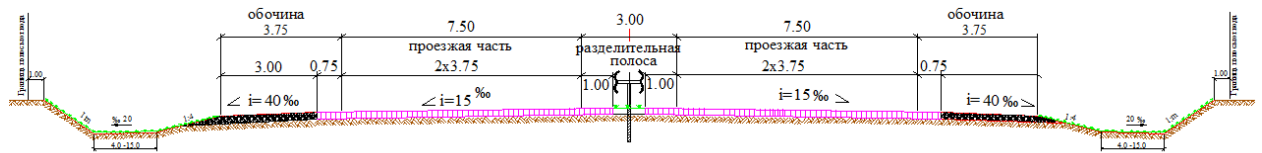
(b): Typical Road Cross-Section for the proposed rehabilitation and widening of the existing road.
